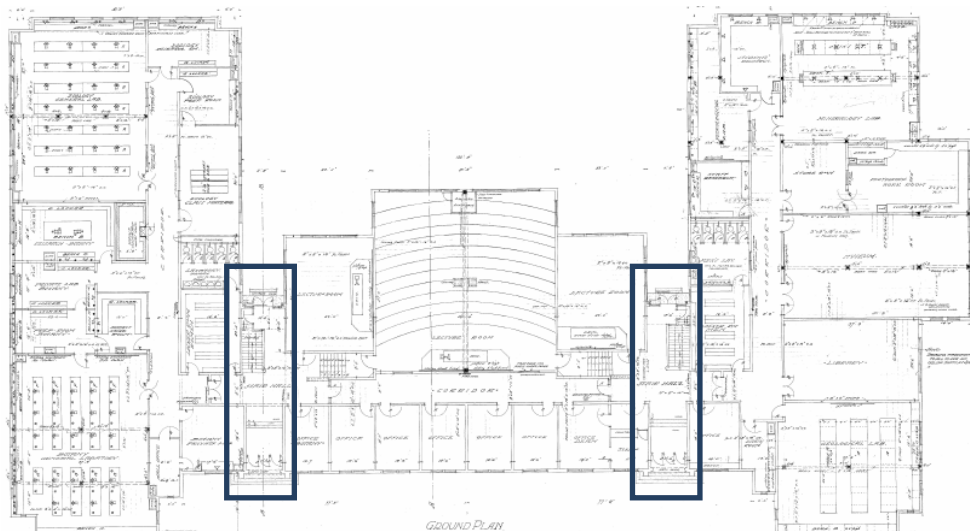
Ground plan highlighting the sections of building torn down for firewall installation
